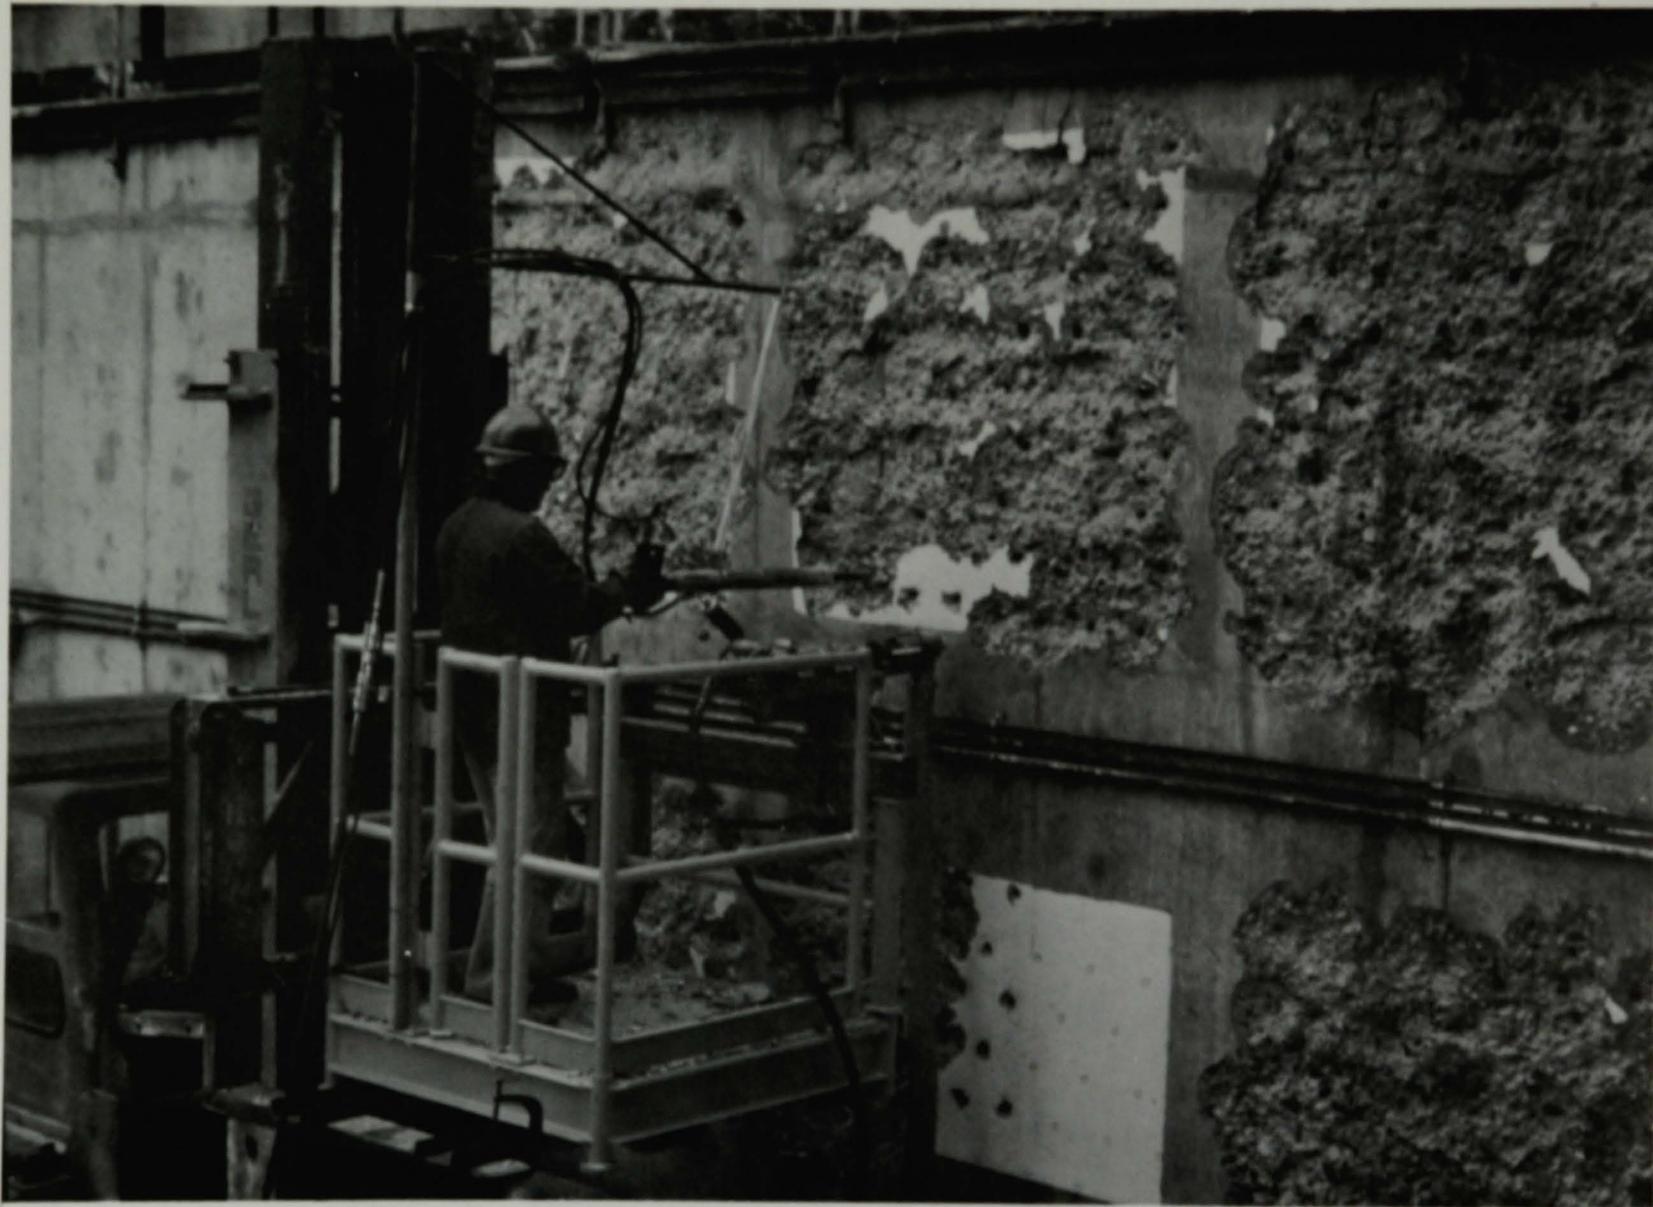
Example of the Concrete Spalling Technique Used in 303-C Building Decontamination
